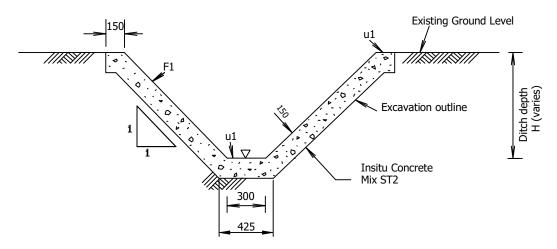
TYPICAL DITCH WITH LINING OF INVERT & SIDE SLOPES WITH IN - SITU CONCRETE
